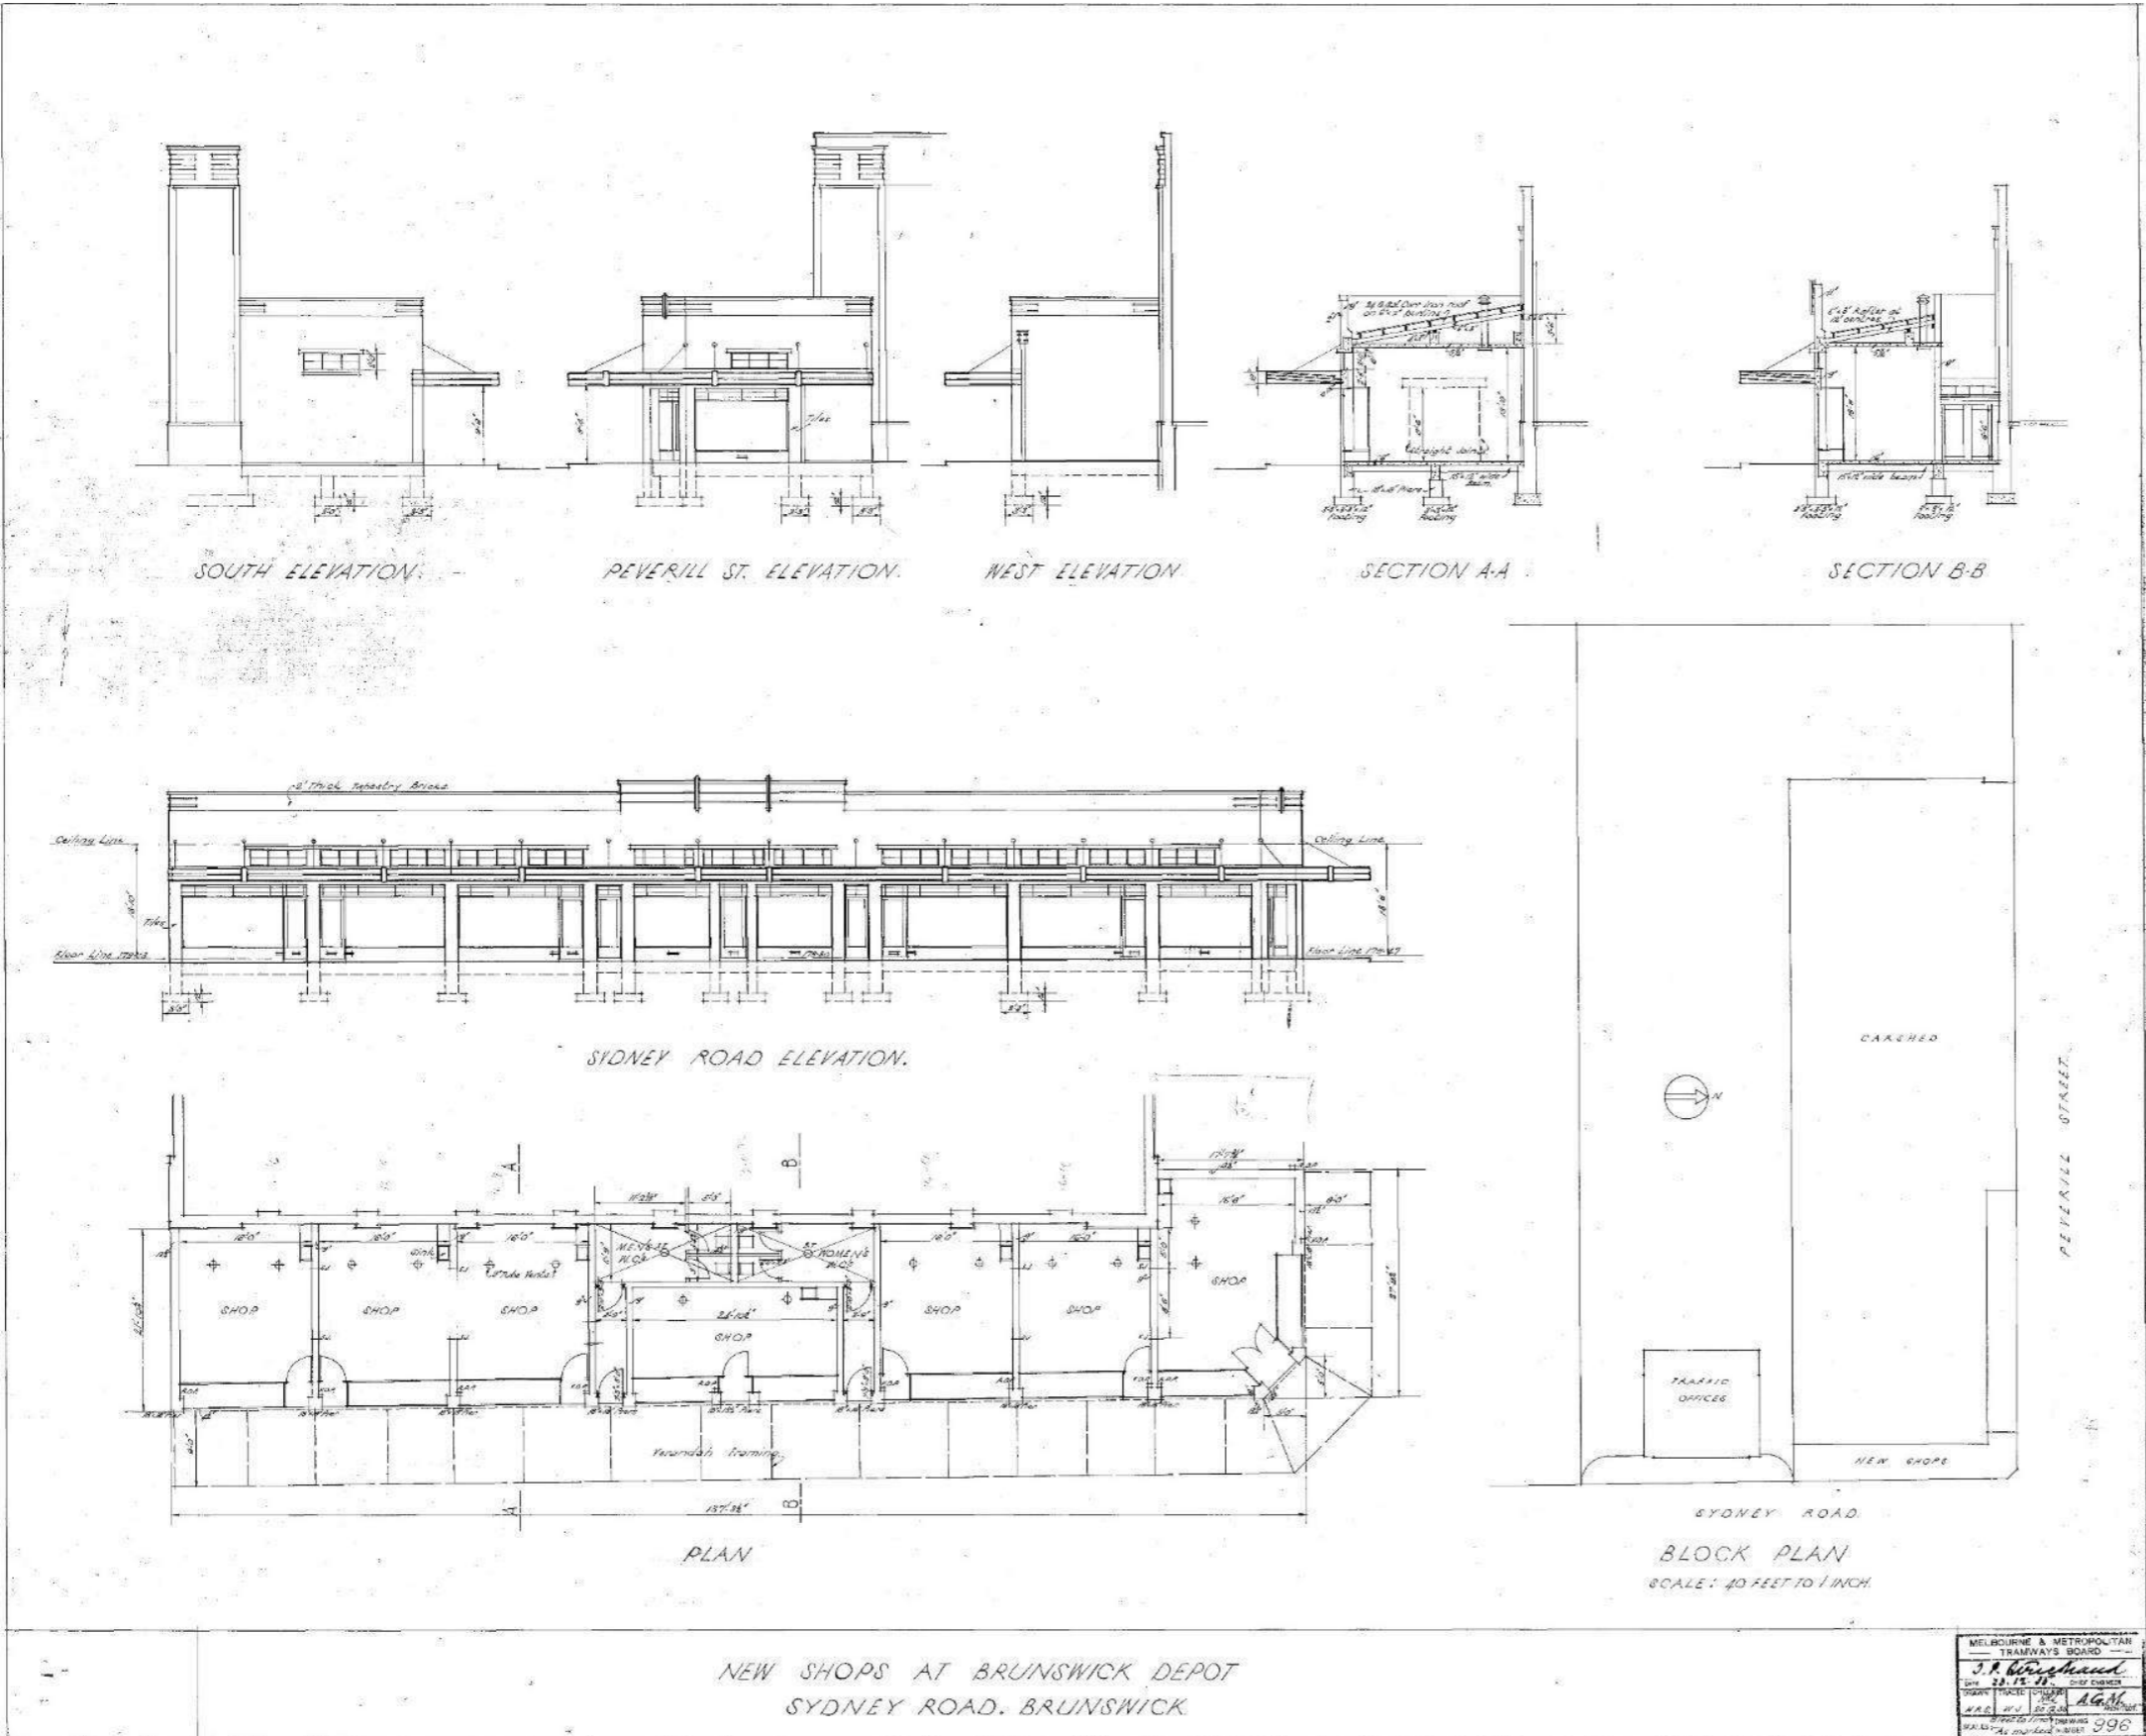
MMTB's 1935 plan of the shopfront building, showing the floorplan, along with the north, south, east and west exterior elevations, and two interior sections
